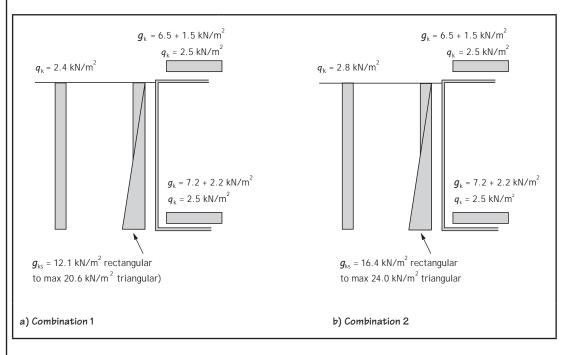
4 Characteristic actions on basement wall and adjacent slabs: water below basement level
